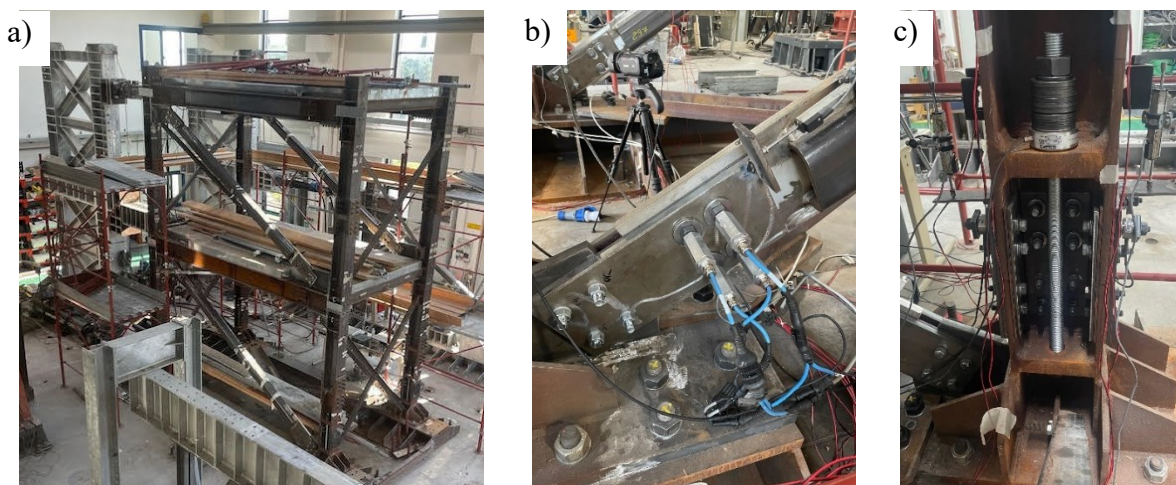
Large-Scale Test Specimen: a) Test Specimen; b) Brace with FDs; (b) SC-CB connection.
